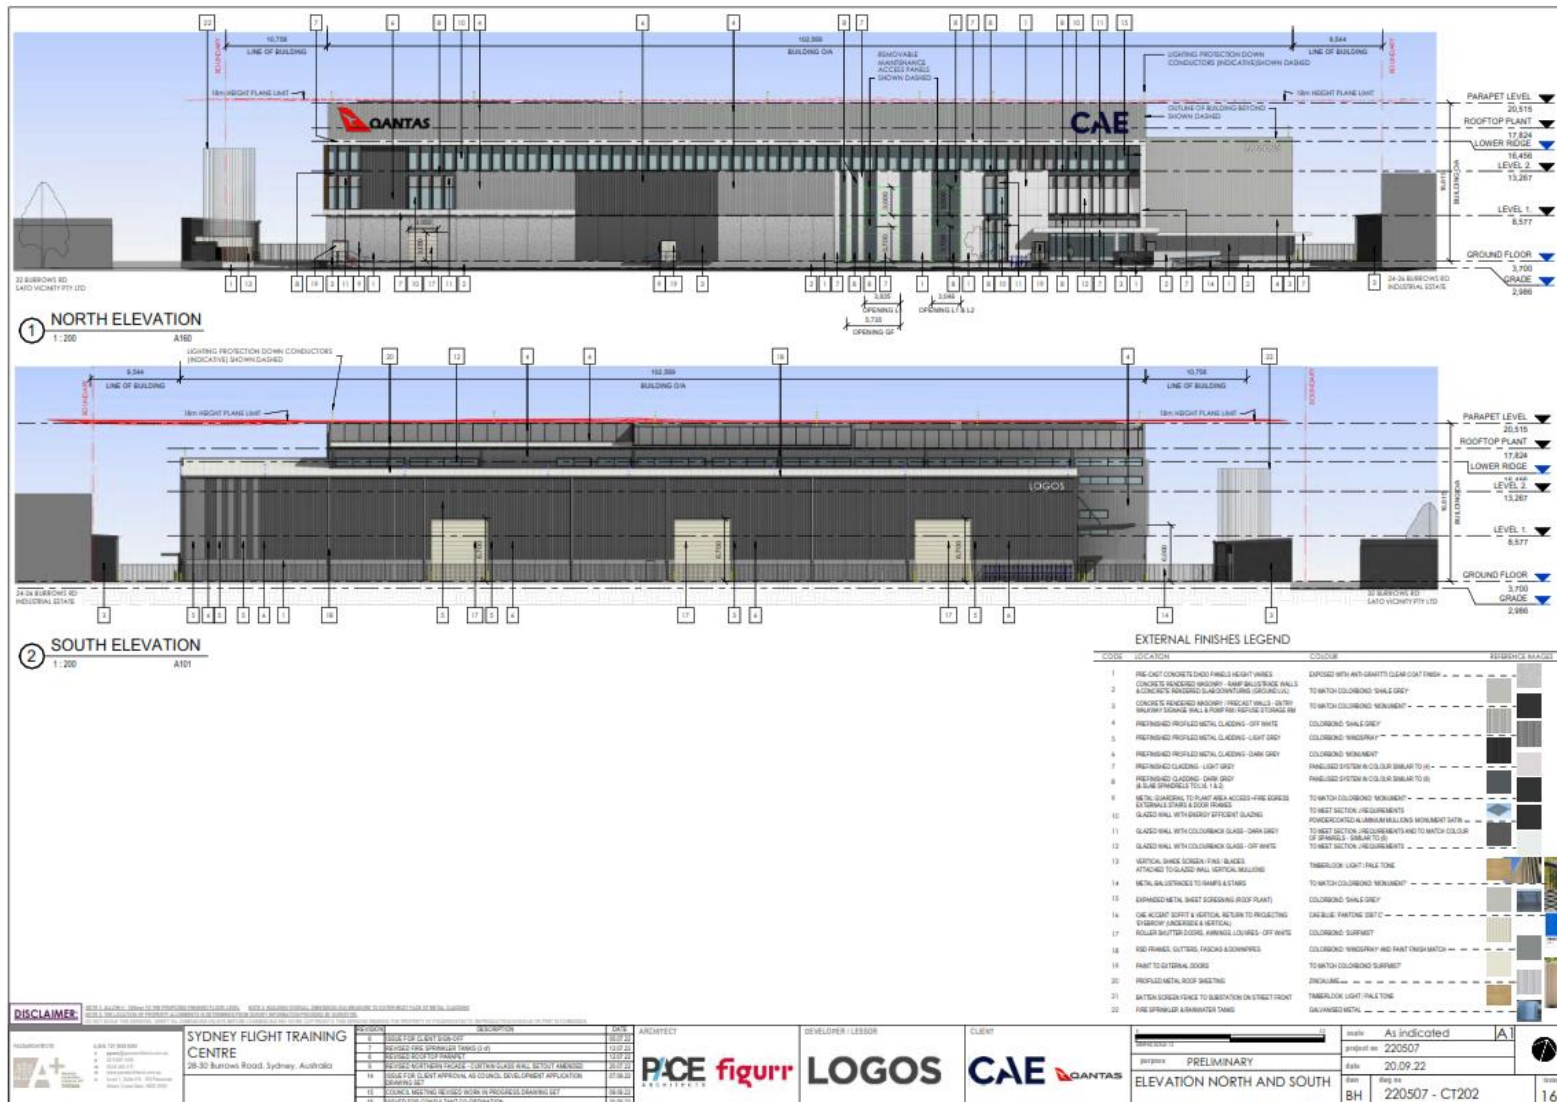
North and South Elevation of Sydney Flight Training Facility 28-30 Burrows Road. (Source: CAE and LOGOS, 2022)
